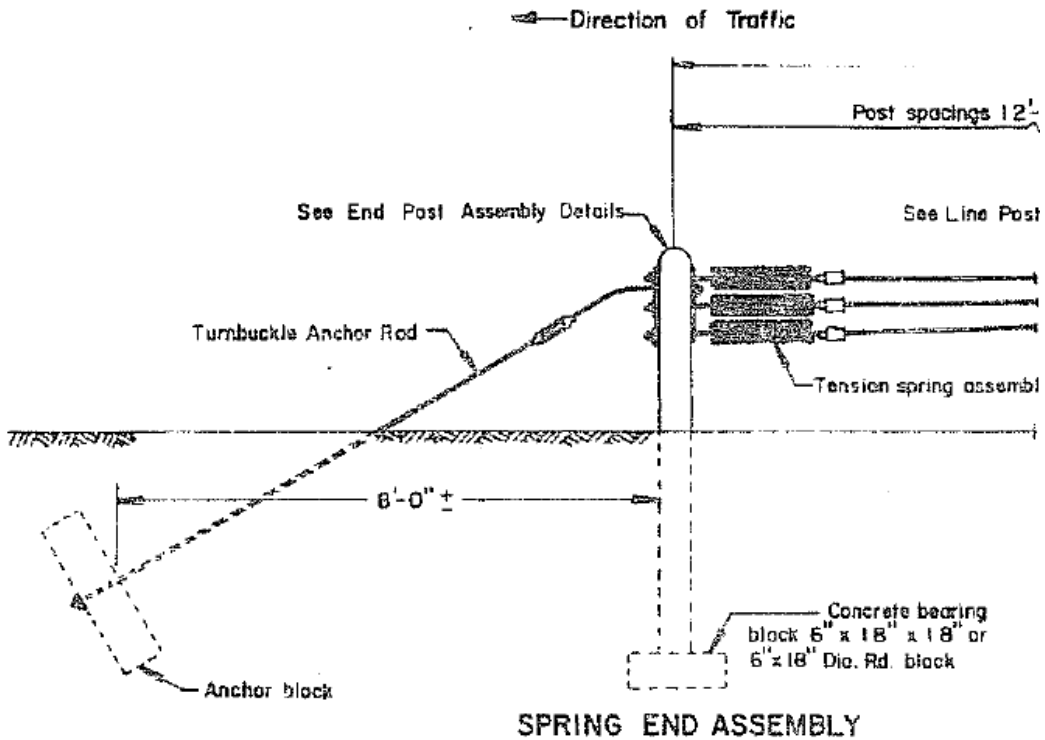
Three Cable Guardrail with Buried Anchor Block
